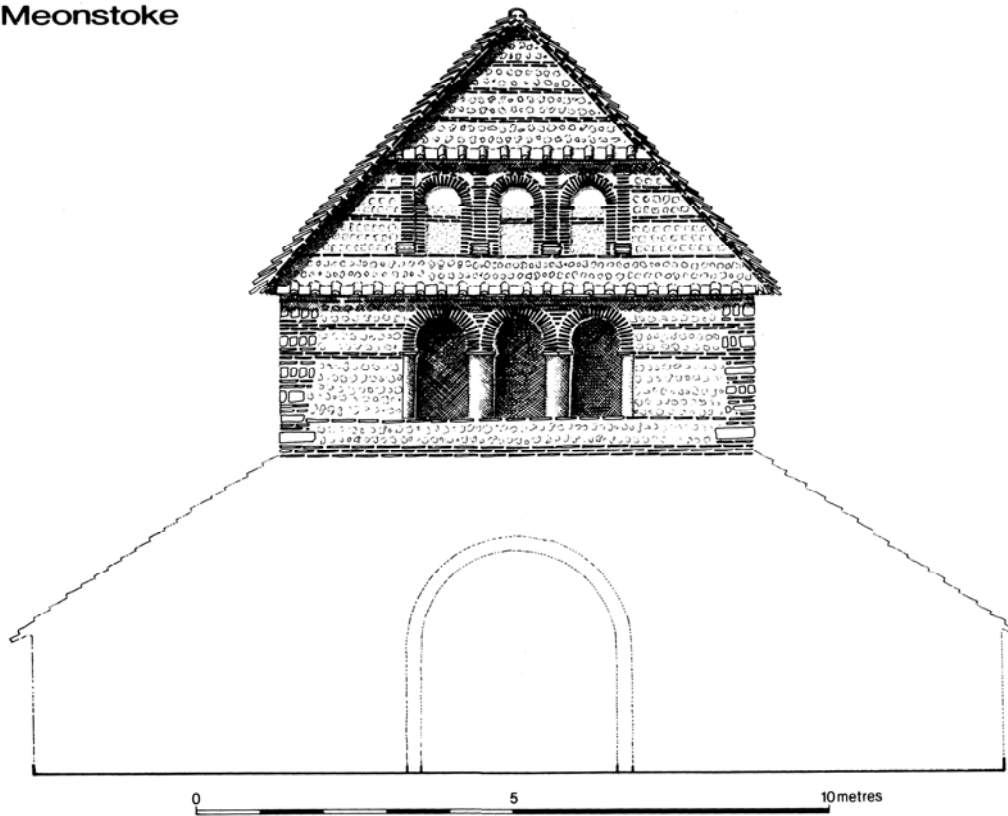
Collapsed building façade from Meonstoke, Hampshire.
